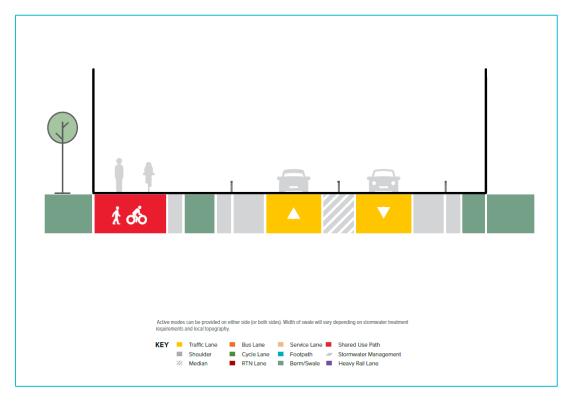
Generic 24m wide cross section is proposed with two lanes for general traffic and active transport facilities on one side of the corridor.
